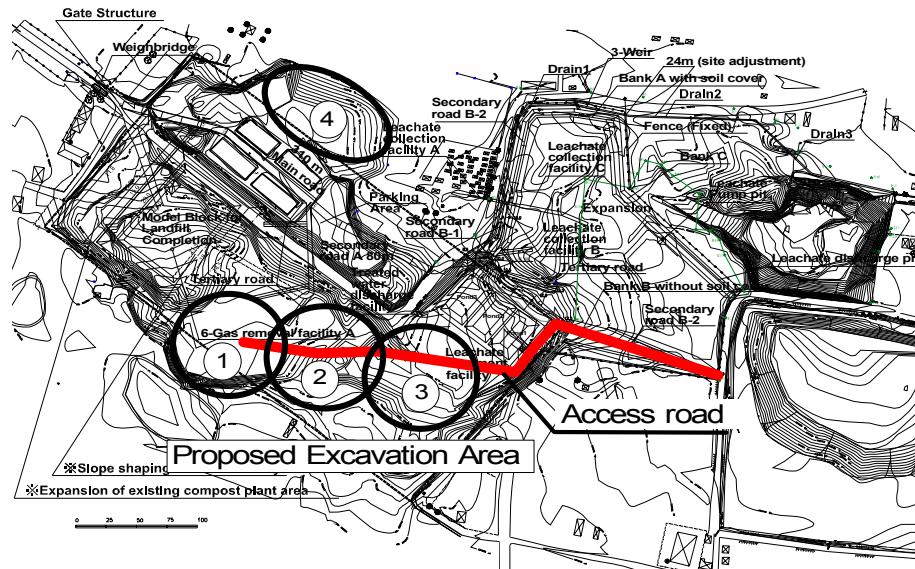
Propose Excavation Area of Aged Waste and Access Road
